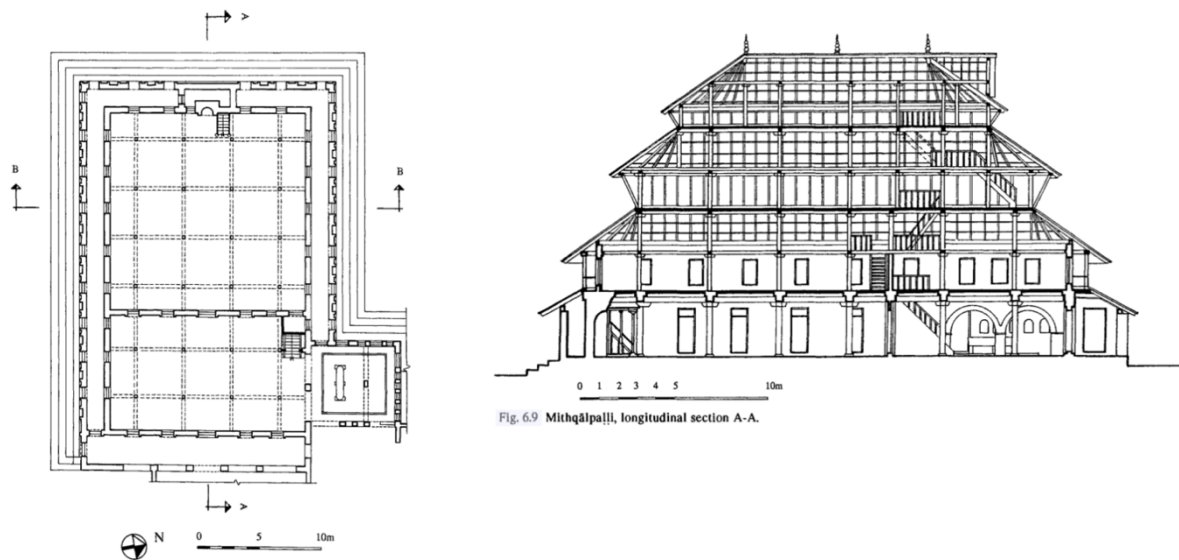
Mithqalpalli, longitudinal section A-A.
